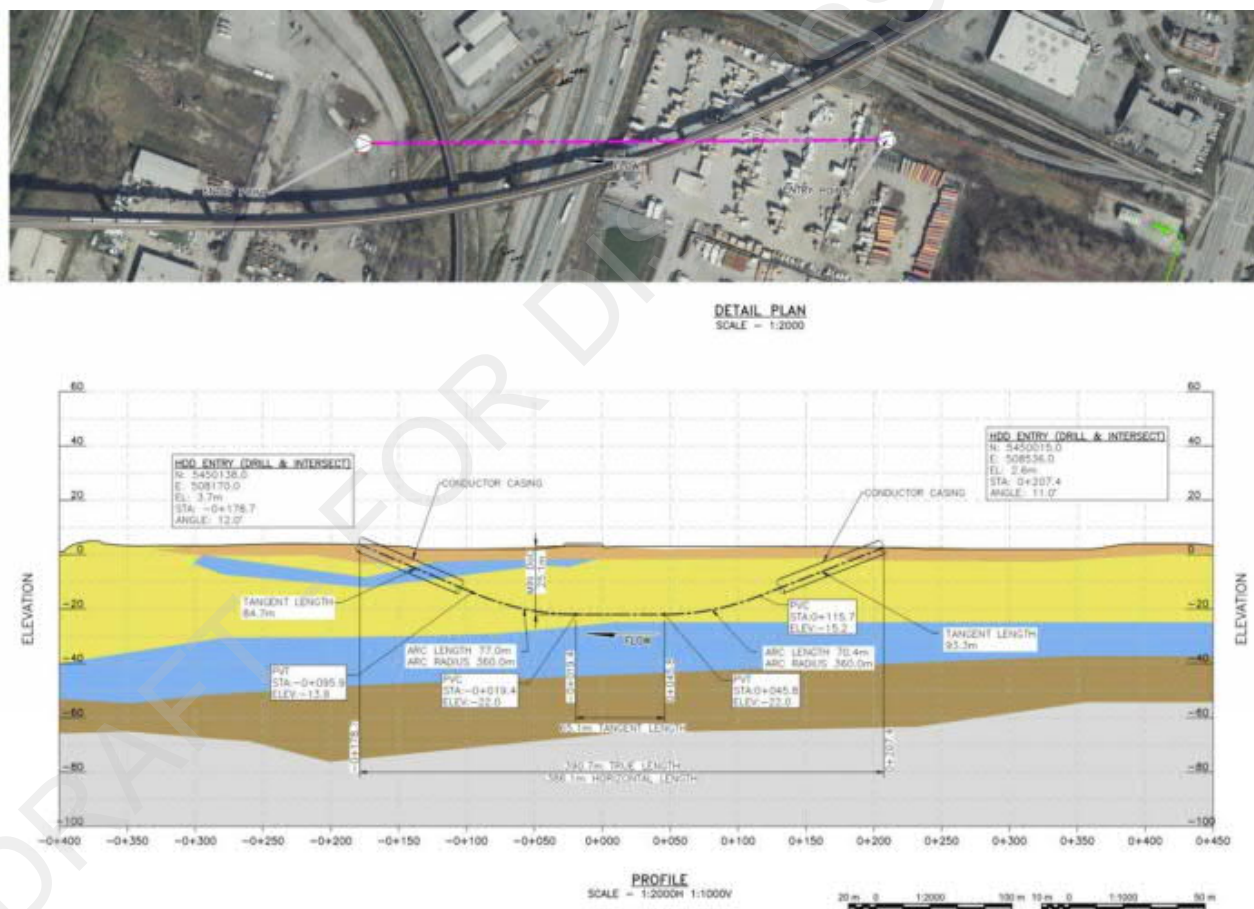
Route A2 Plan and Profile – From Pre-FEED Study
